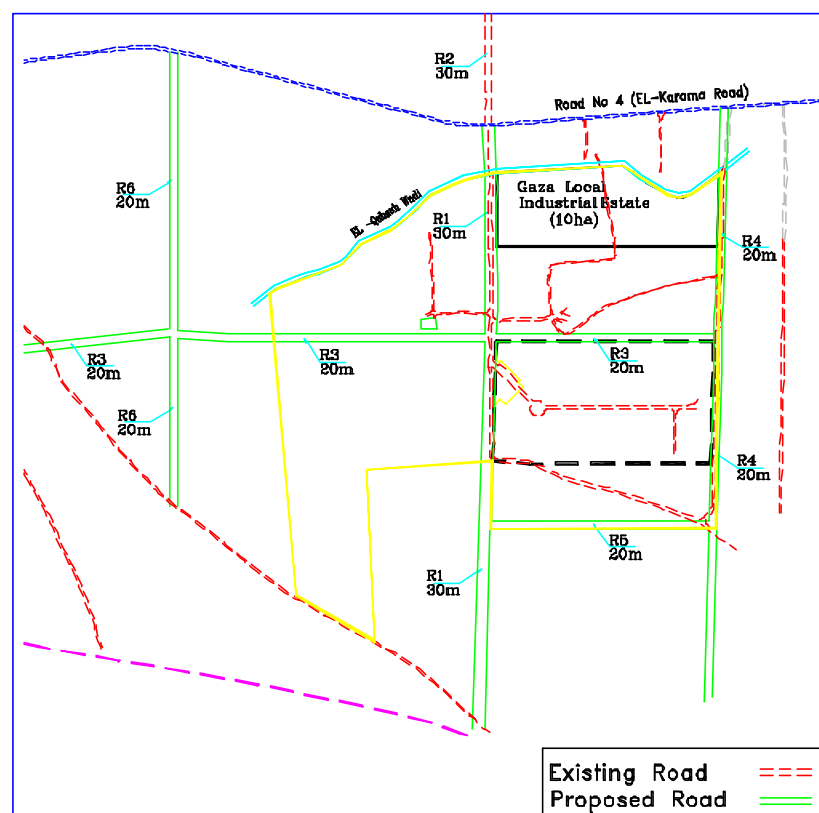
The Proposed and Existing Roads Leading to and Crossing the Proposed GLIE
